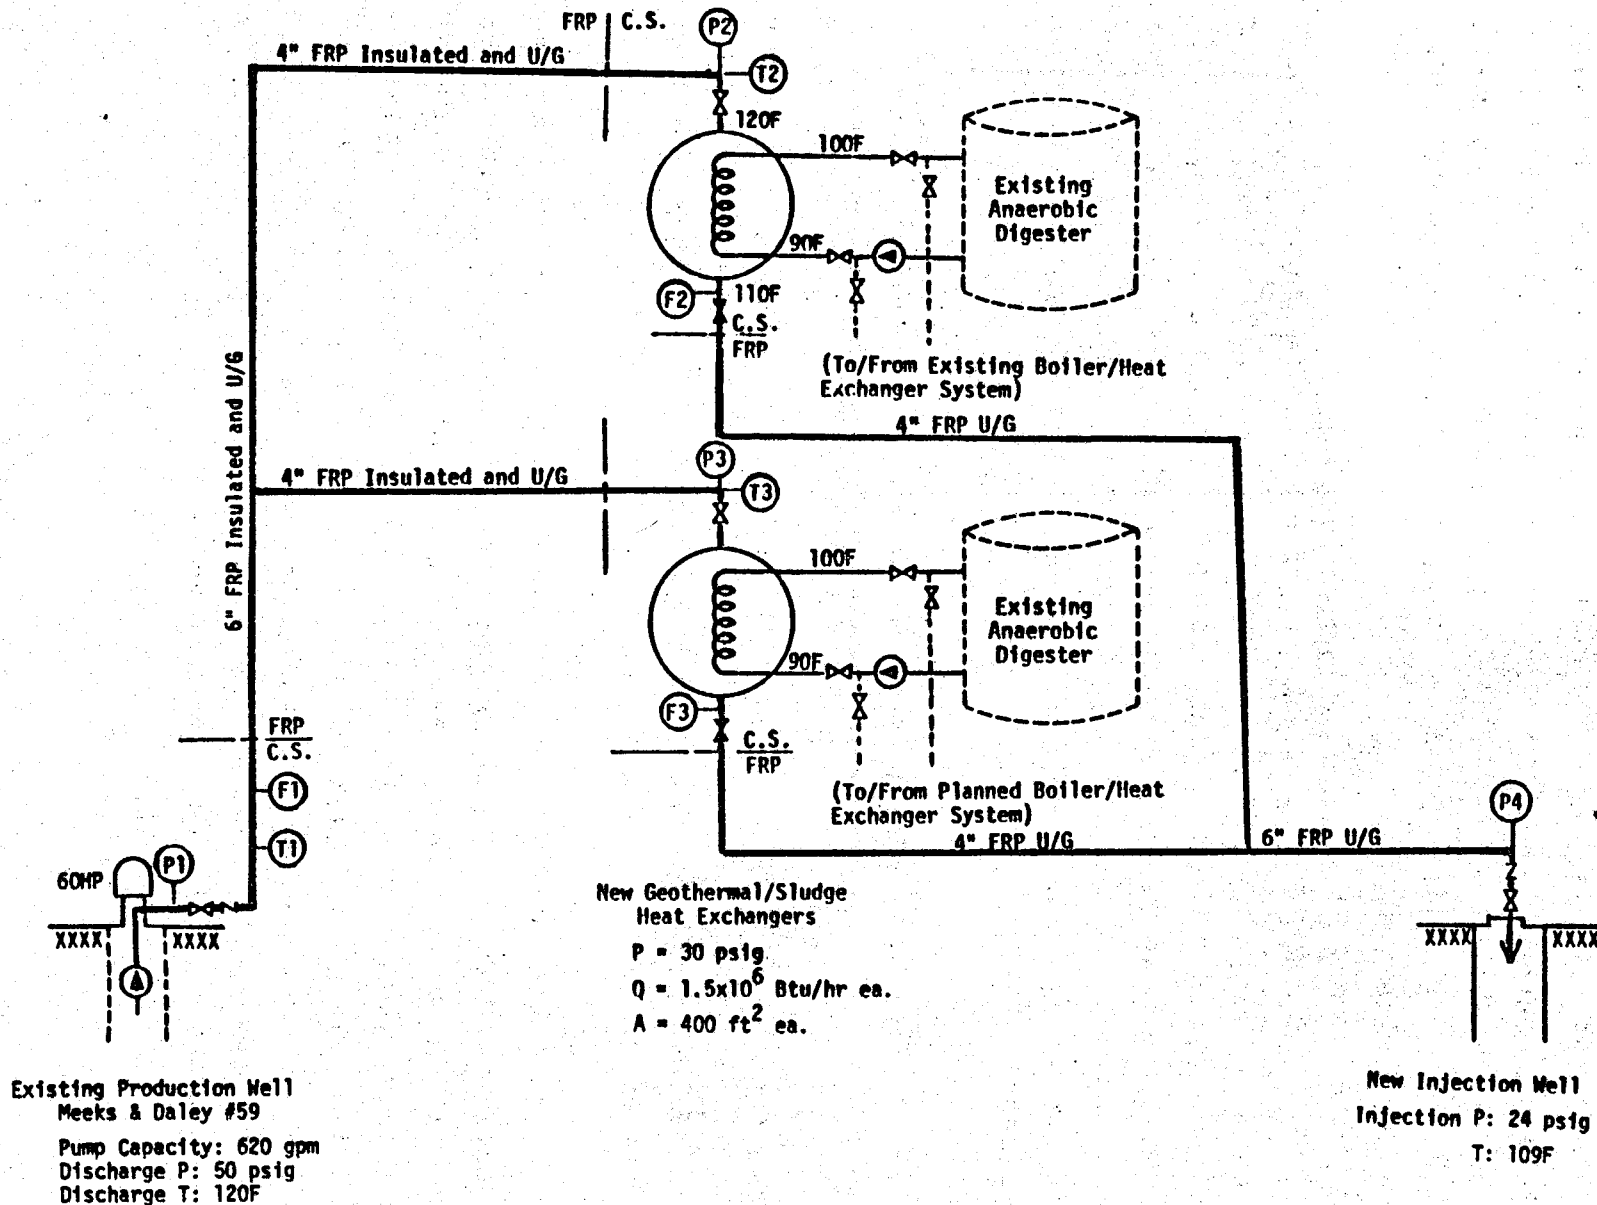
Piping and Instrumentation Diagram - Design Case 4
